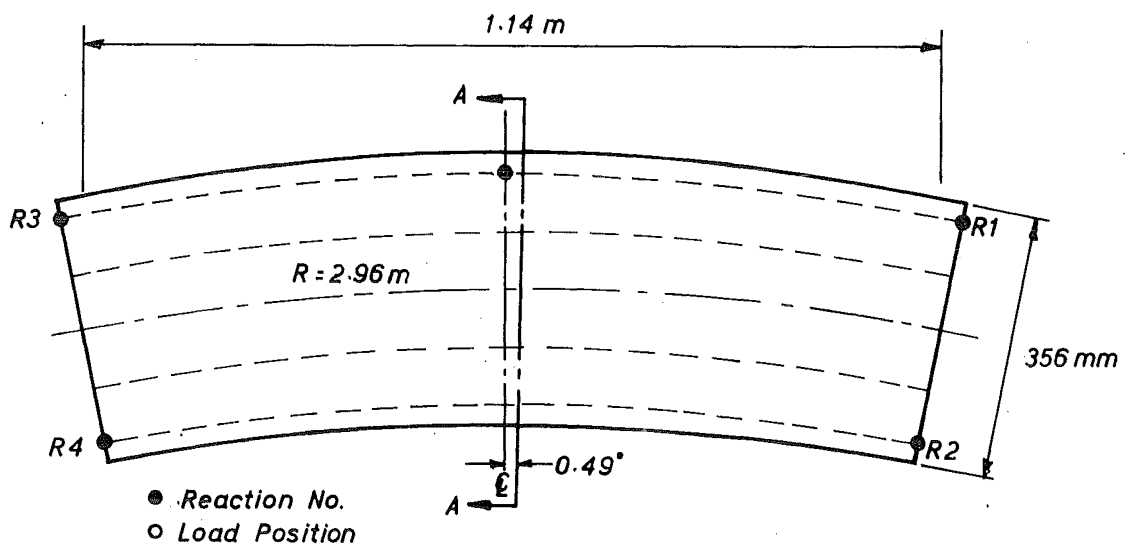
PLAN OF MODEL NO. 2
